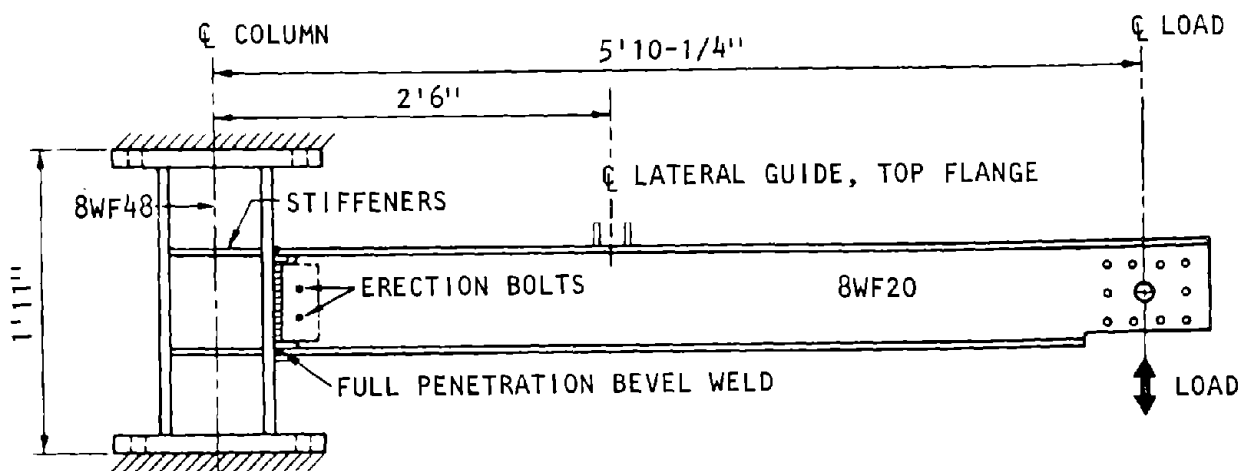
Beam-Column Connection, Type I, Detail Showing Test Device (Popov-Pinkney, 1968)
